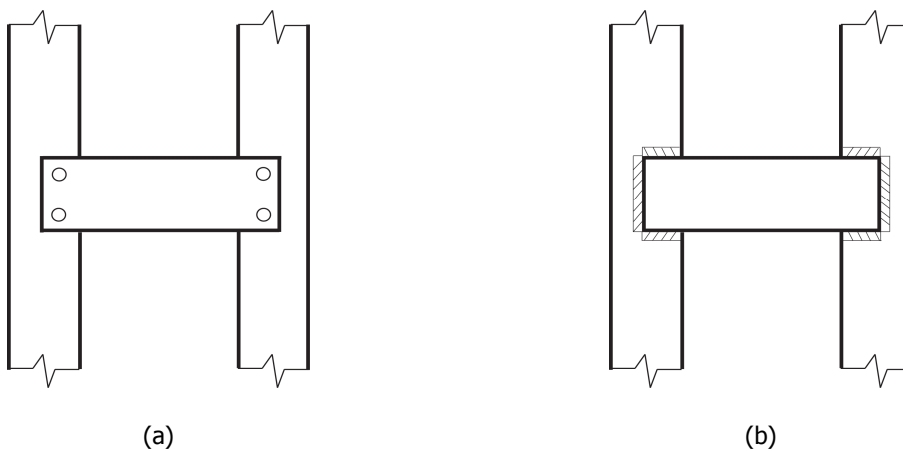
Connection of batten to chords (a) with rivets and (b) with perimetrical welding
